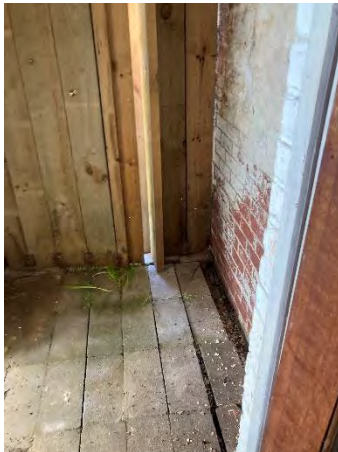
Rear airlock (lean-to) requires repairs to floors, walls, ceilings and roof.
